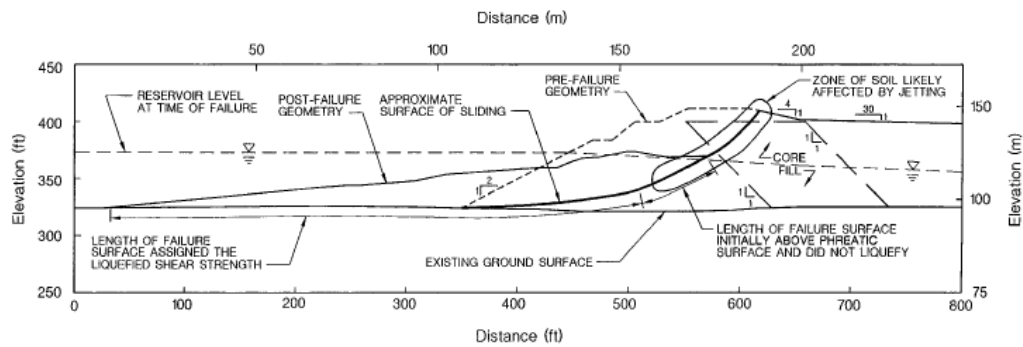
Post-failure cross-section of the Wachusett Dam-North Dike (Olson et al., 2000)
